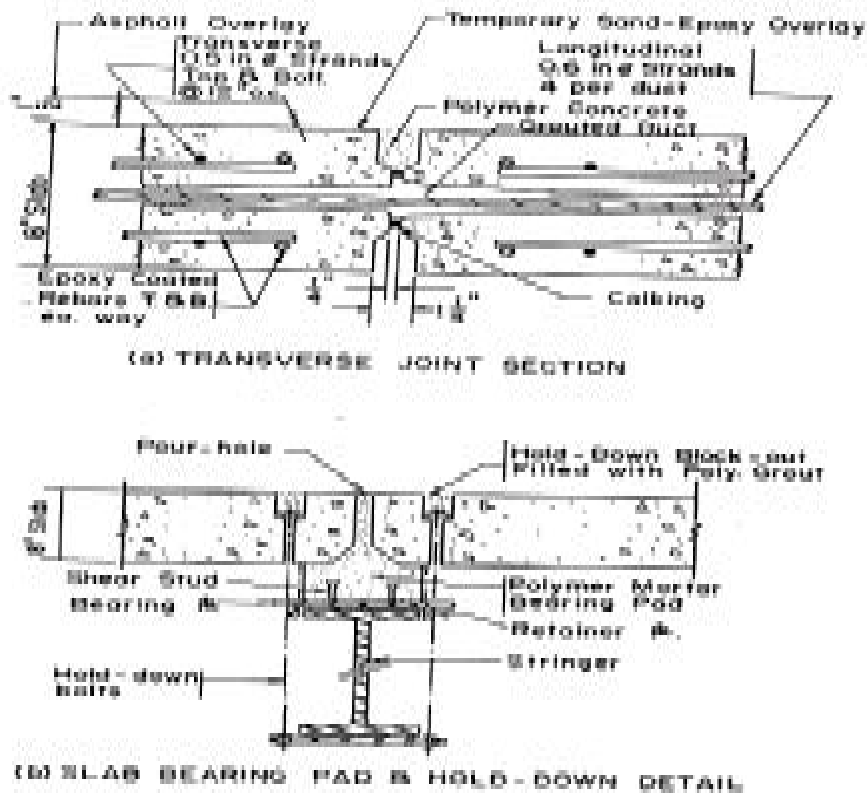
Joint details of the Woodrow Wilson Memorial Bridge
